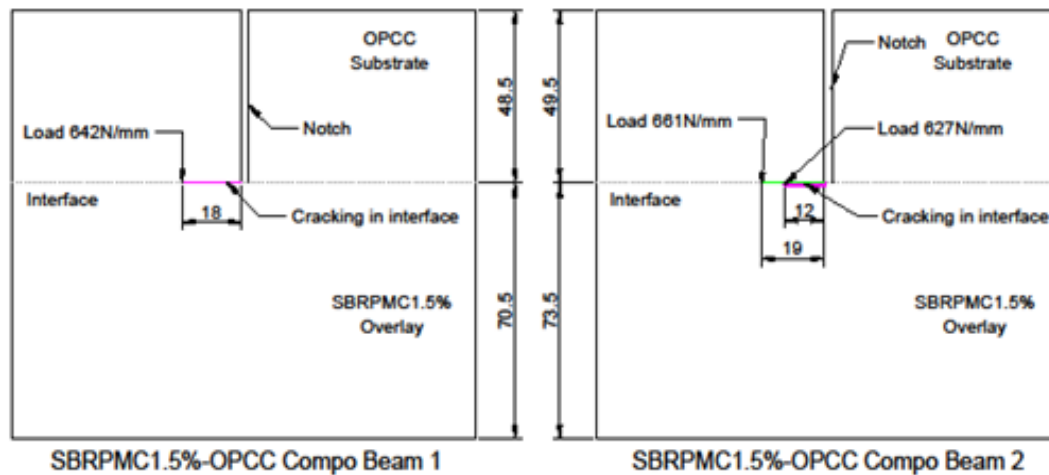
Crack lengths of interfacial delamination and the corresponding load readings of beam 1 and beam 2 under shear test
